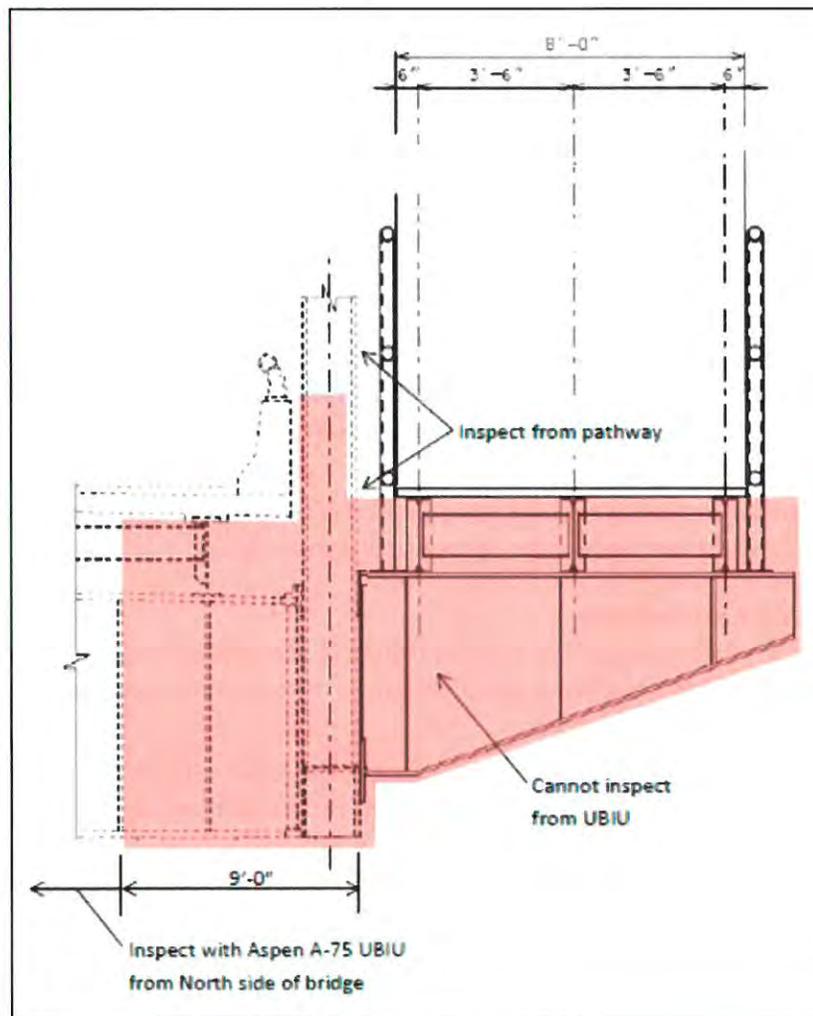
Areas of Eastbound Blanchette Bridge truss span unable to be inspected with proposed walkway installed
